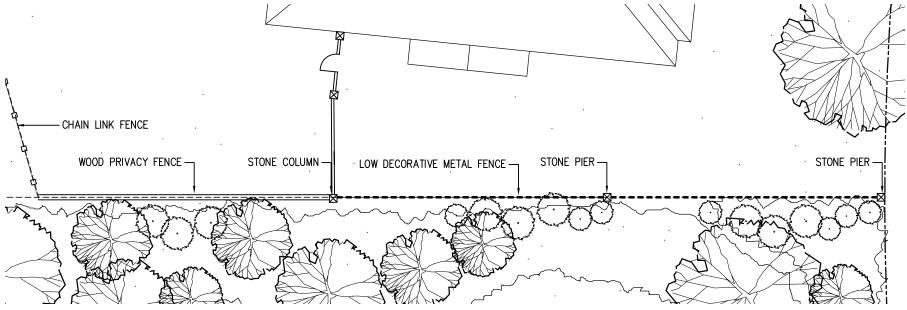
Enhanced Sideyard Adjacent to Park - Plan
